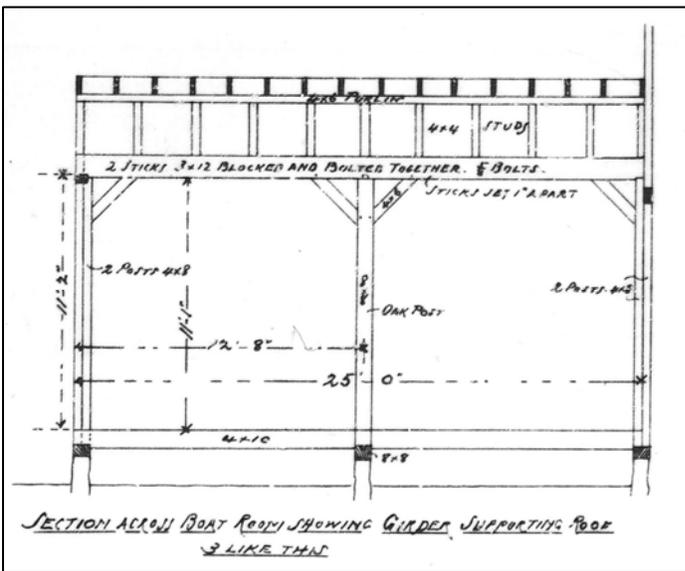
Framing of typical interior bent in Duluth-type station Boat Room.
